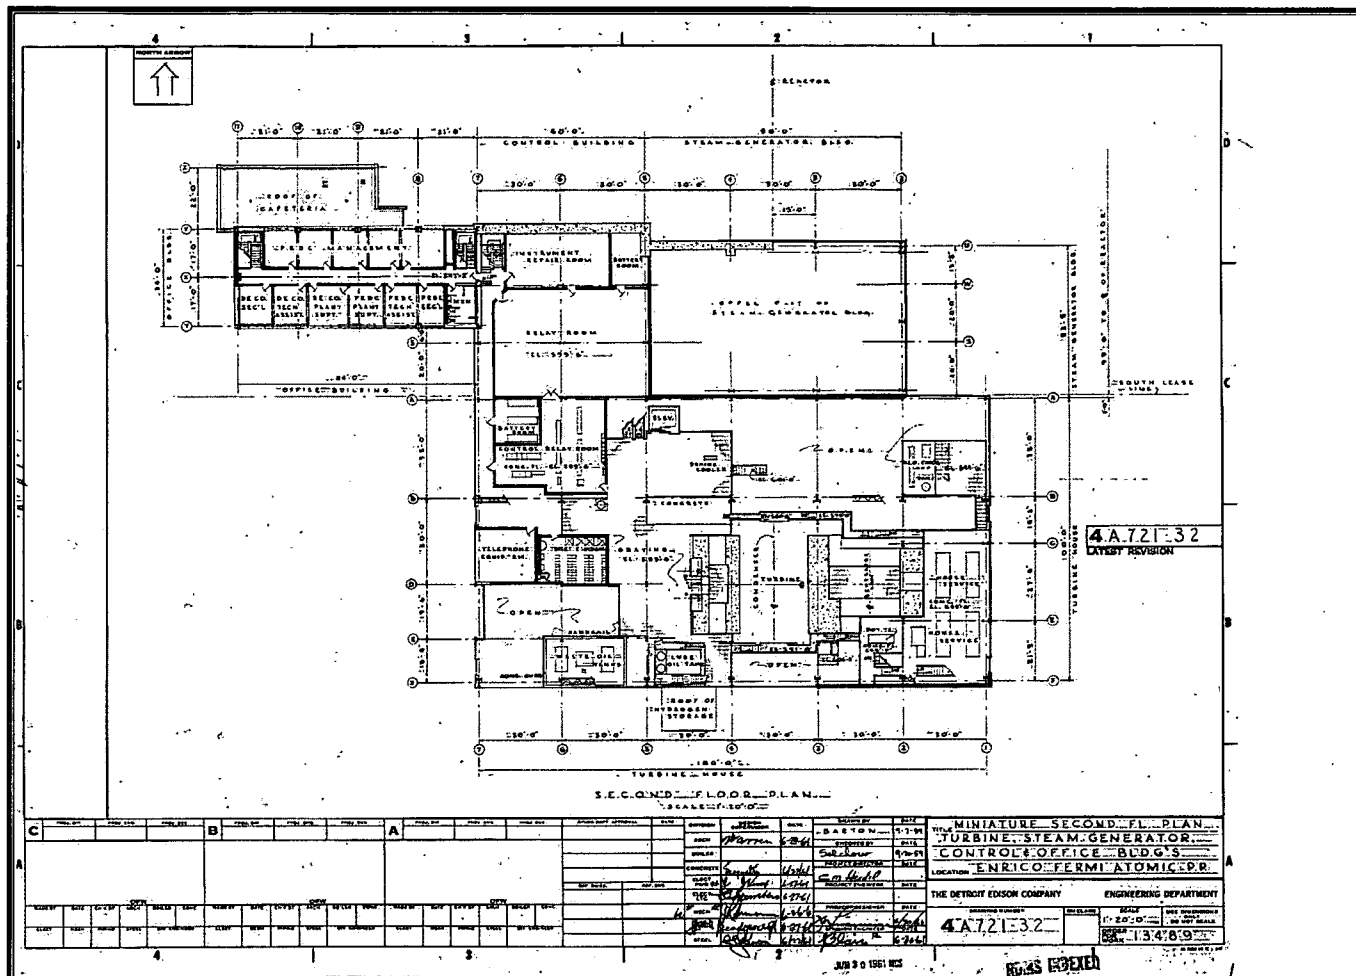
Second floor plans of turbine, control room, office, and steam generator buildings (Courtesy DECo)
